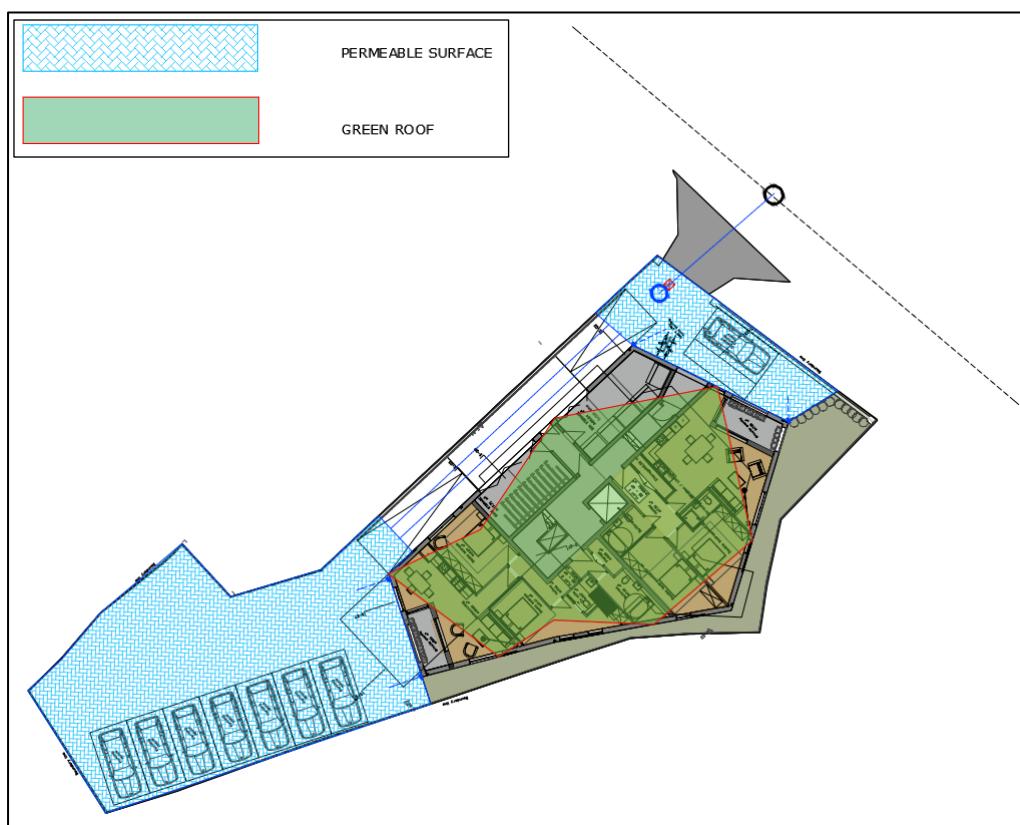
Indicative drainage layout plan showing the proposed location of SuDS.
